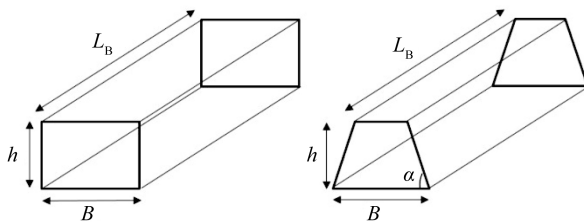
Rectangular and trapezoidal breakwaters as test models.
